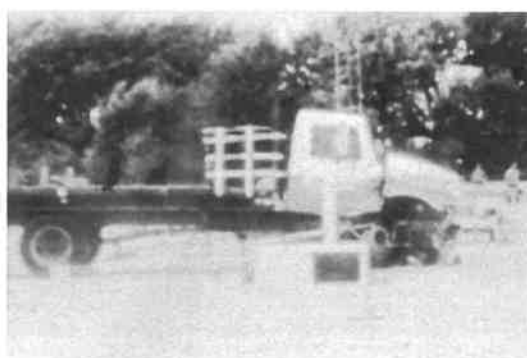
Sequential photographs for test 400001-USR21 (frontal view).
